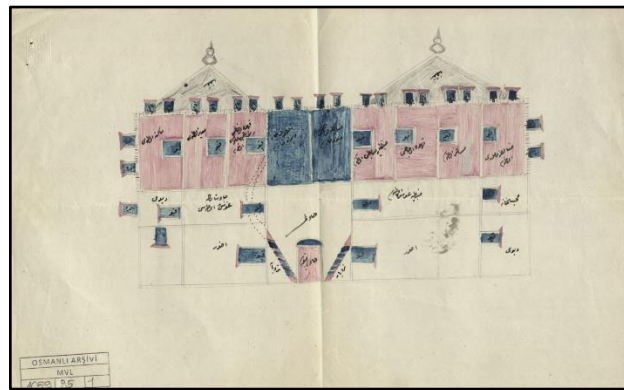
Drawing of the telegraph office building proposed to be built.
